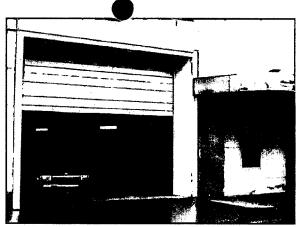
Existing area to be remodeled. New storefront would be installed where loading door currently exists. Existing window to remain can be seen at right of photo.
